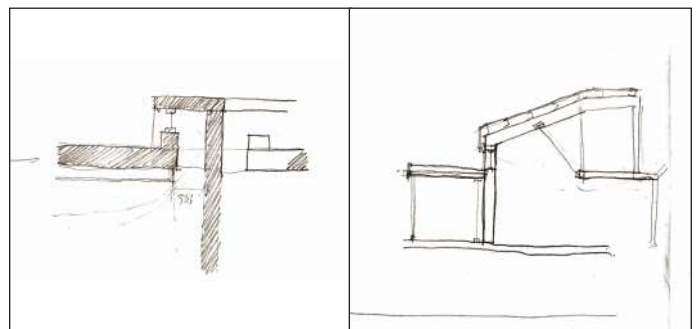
Accommodation light and gym mezzanine structure (Author: 2019)
